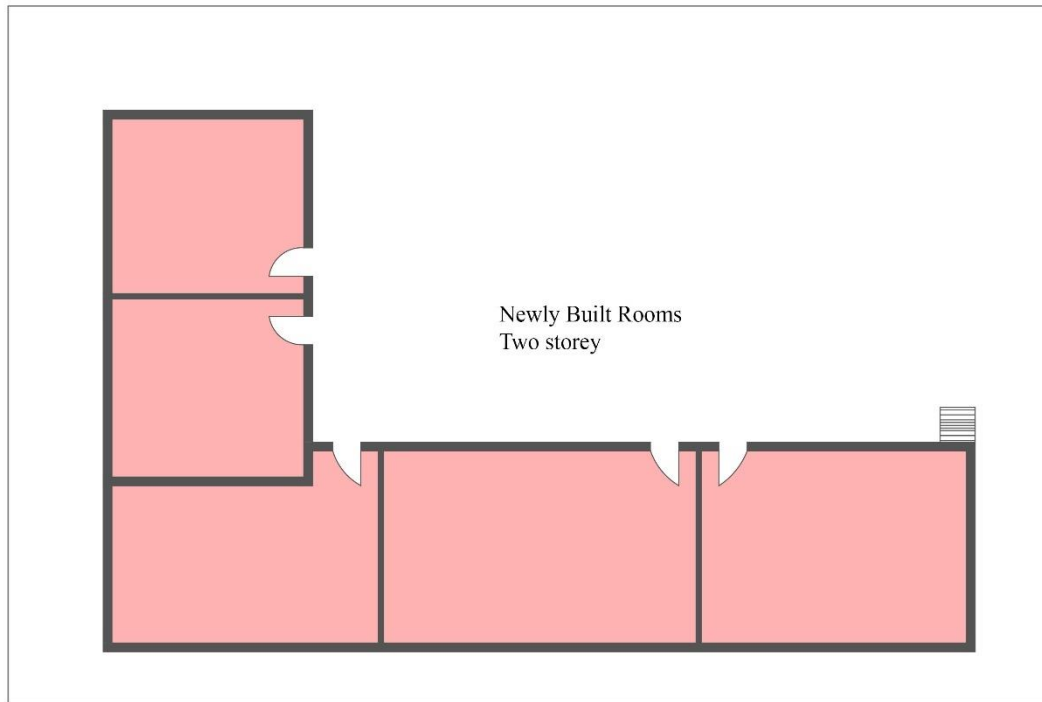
Image showing an example housing plan of a newly built backyard structure, source: Author, 2019
